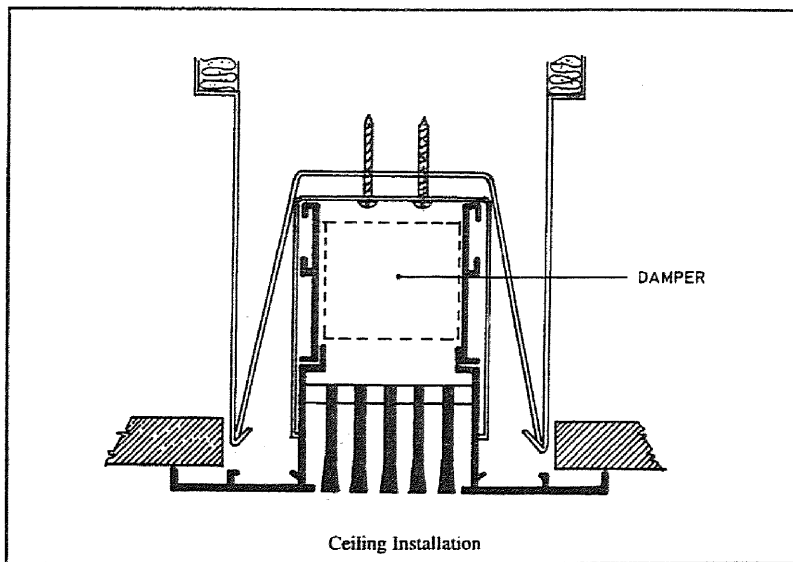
Installation of grille registers for location of ceiling, side-wall and floor.
